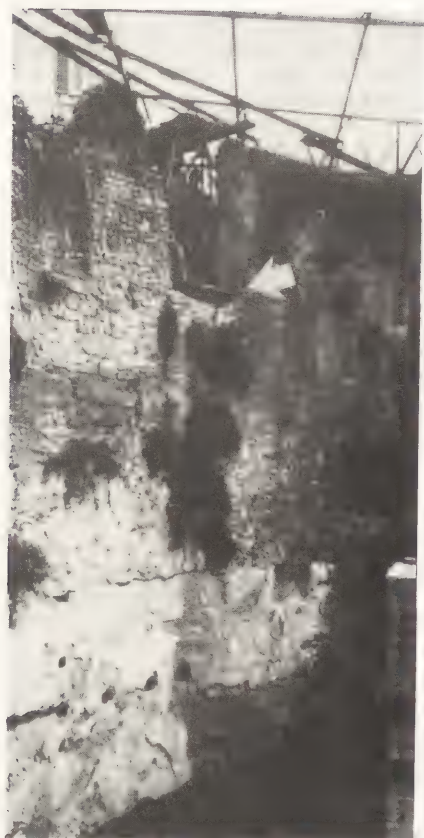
View of the wall of tuff blocks. The arrow indicates the level of the embankment behind the wall.
